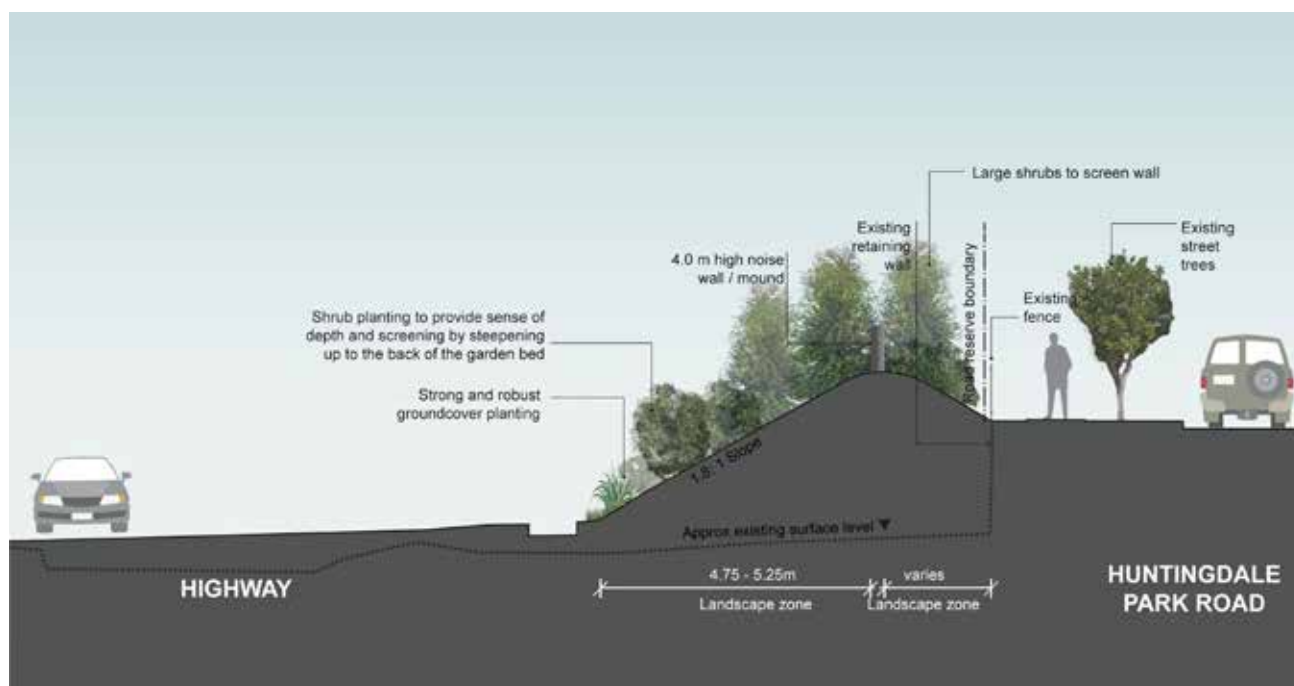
Huntingdale Park Road noise barrier NB02- typical cross section of the proposed wall/ mound
